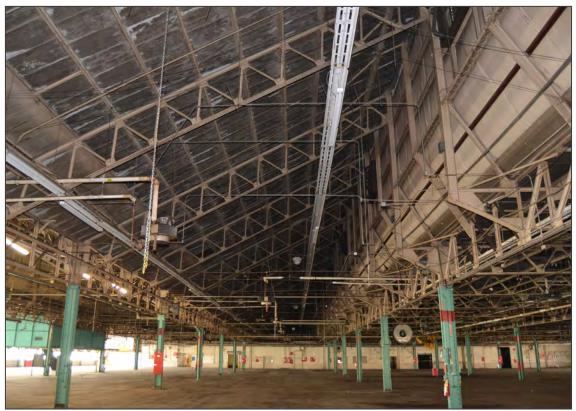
Ford Motor Co. Assembly Plant, Main Assembly Space, Facing East.
